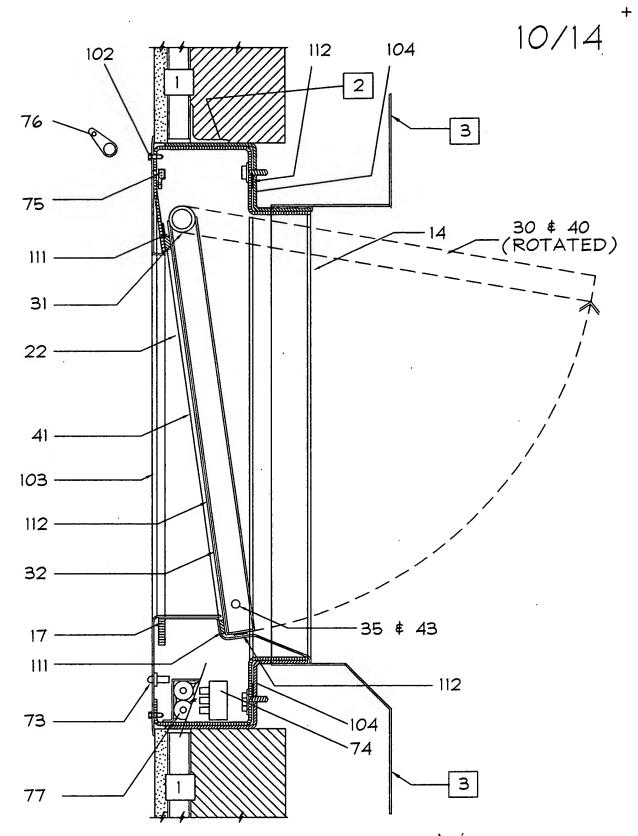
INLET SECTION $\frac{A'}{10/14}$:
